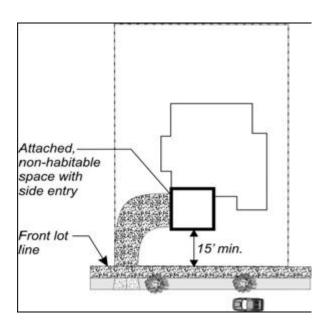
SIDE-ENTRY GARAGE SETBACK
